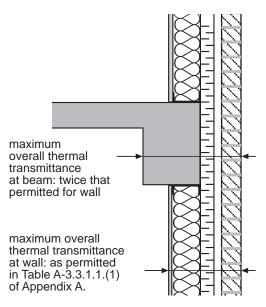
(3) Continuity of Insulation at Beams
